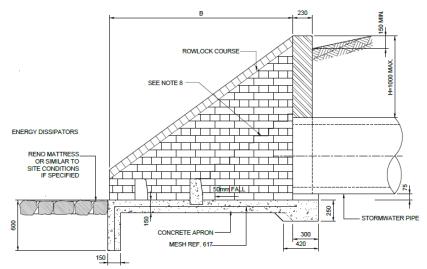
5 Typical Stormwater Headwall with Energy Dissipators
